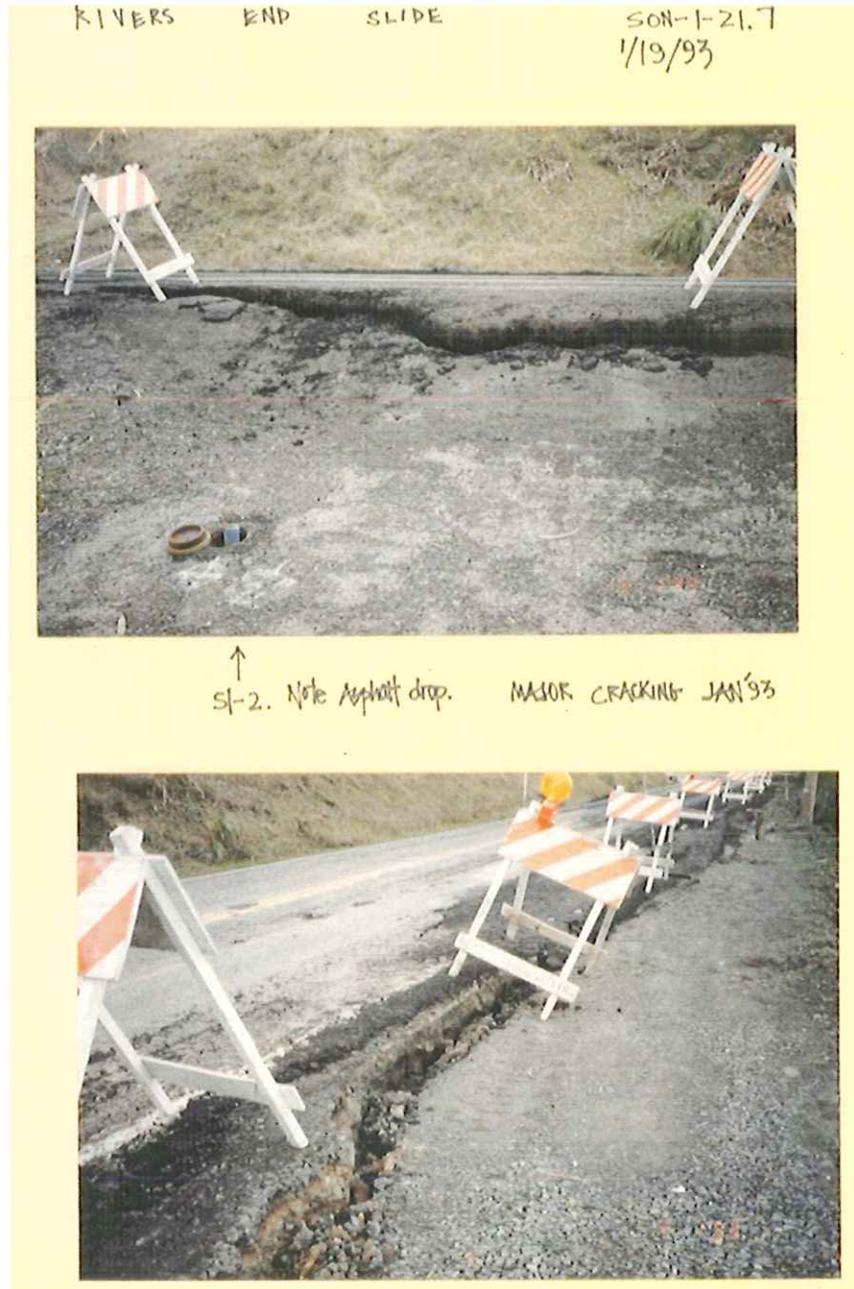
C: Cracks associated with slide movement – Crack in front of the Garage Apartment where the timber Wall is located now (January 1993).
